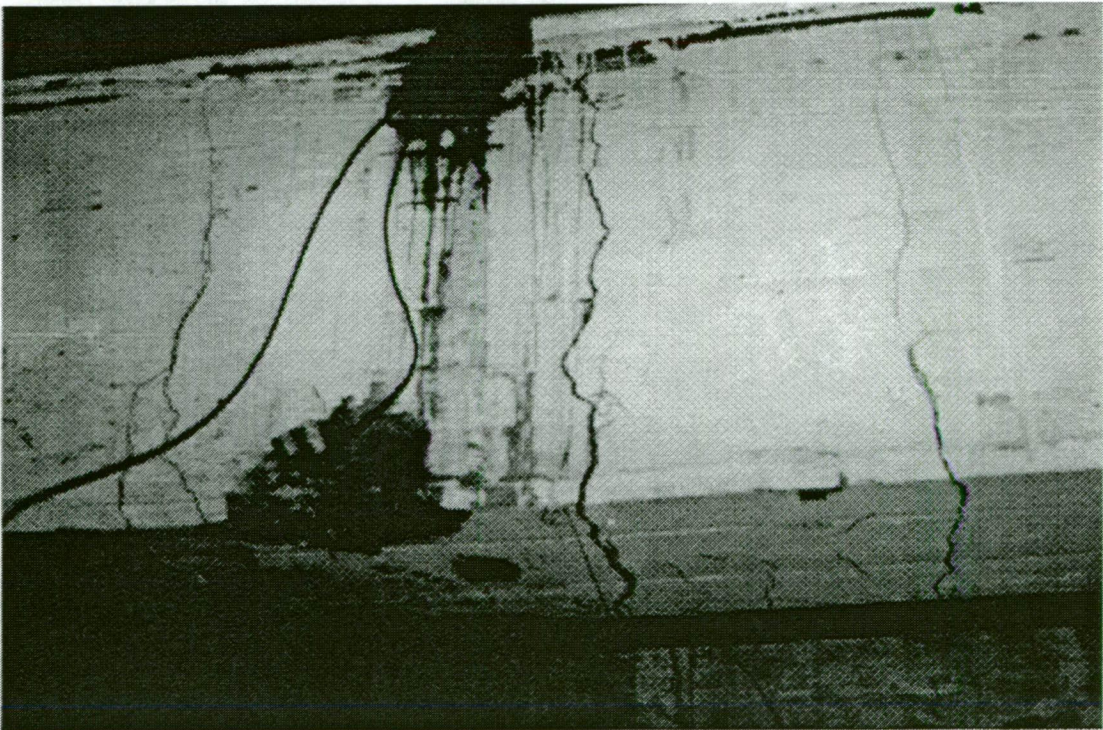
Cracking of Third Beam at Ultimate Load
